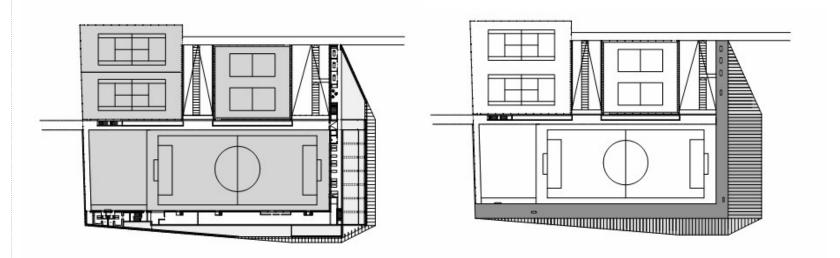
Sport Center ETH Honggerberg Plan. Source: ArchDaily
